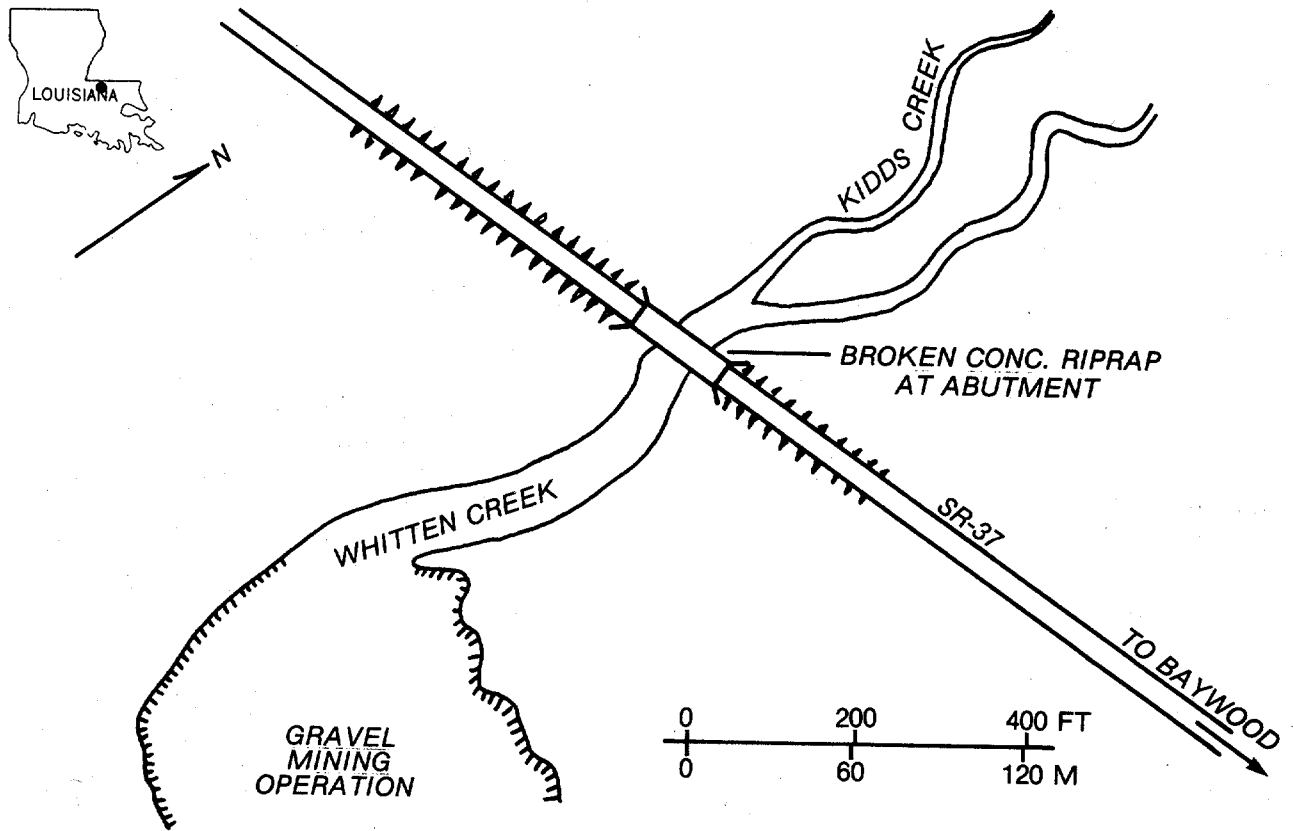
Plan sketch of Whitten Creek at SR-37. (From aerial photograph taken August 31, 1973.)
